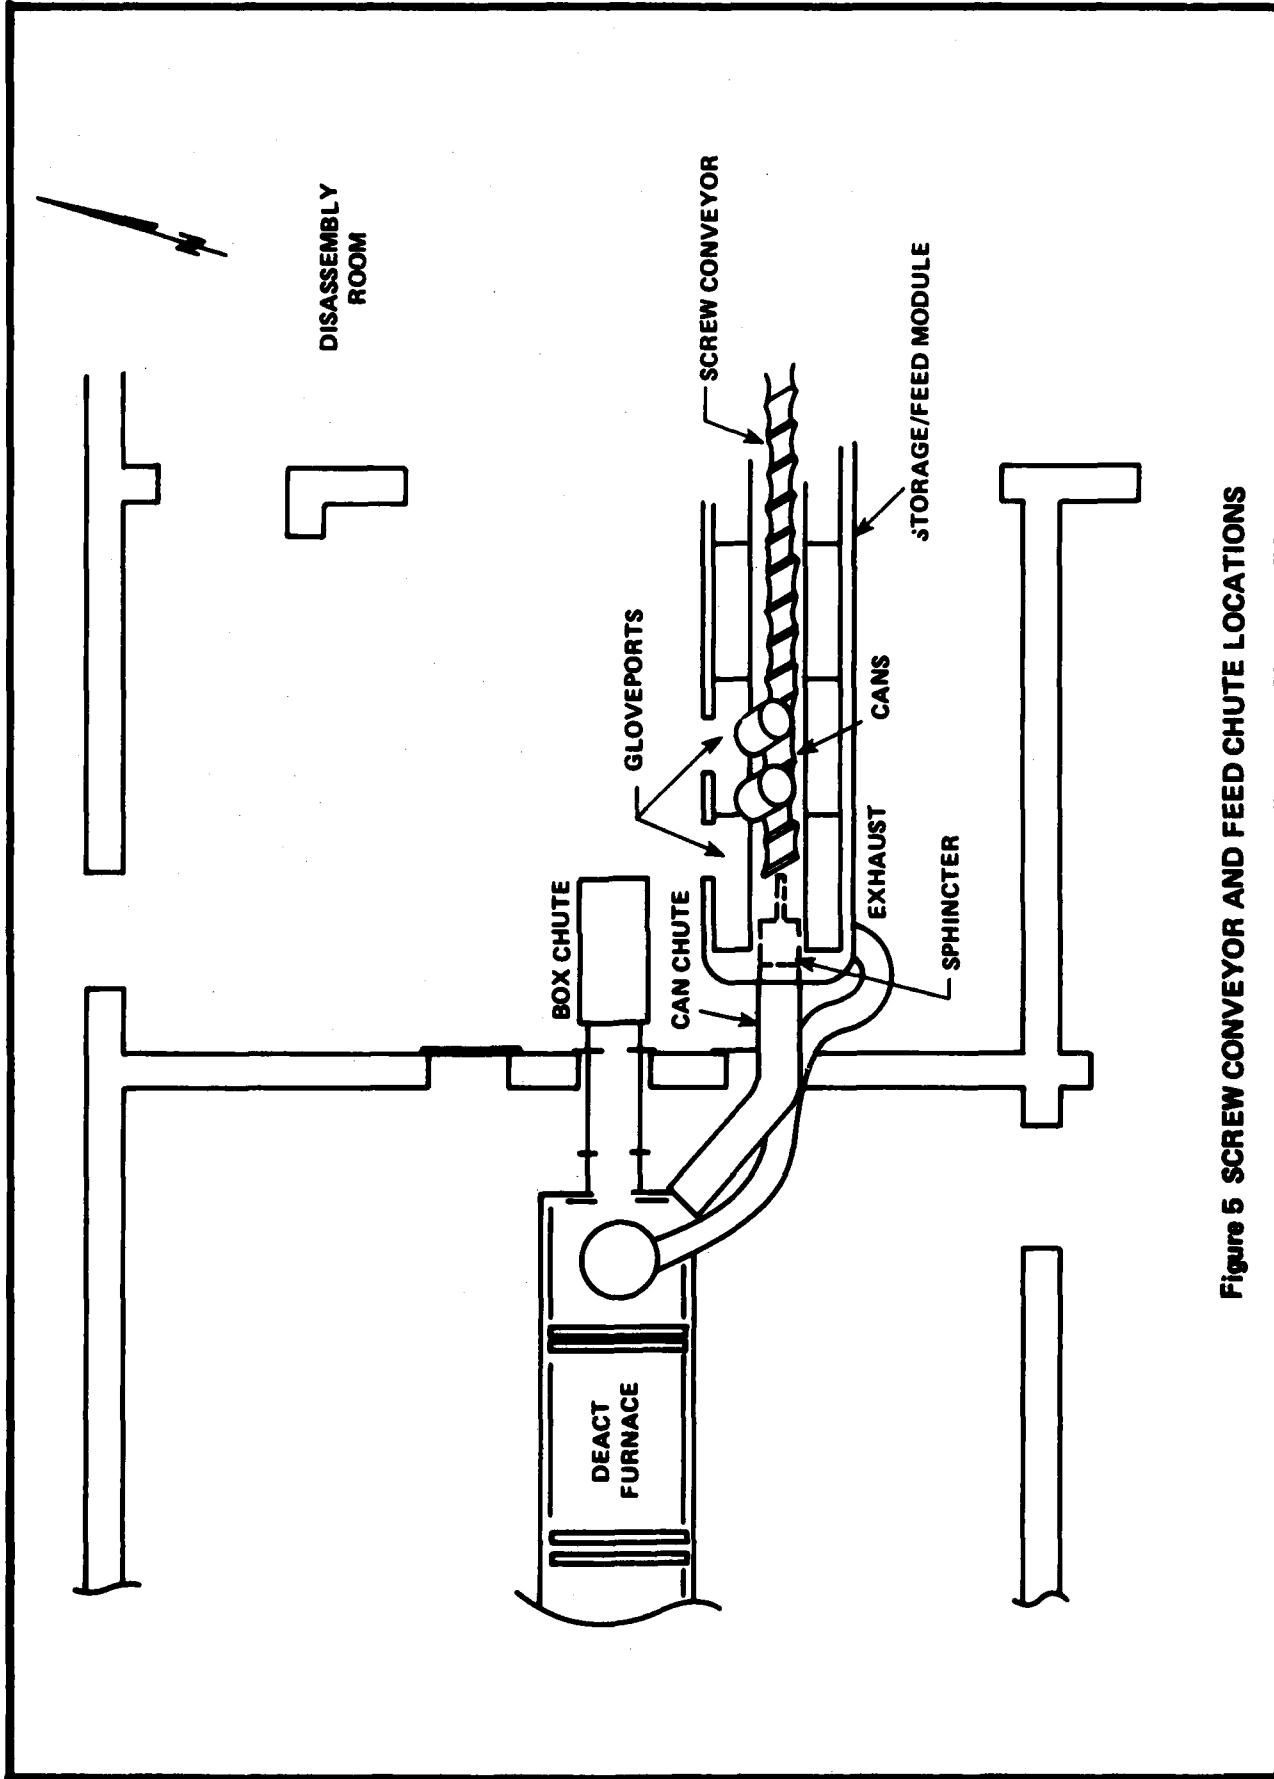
SCREW CONVEYOR AND FEED CHUTE LOCATIONS
